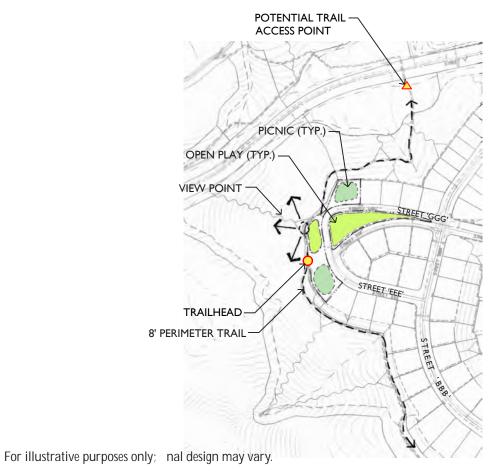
Typical Mini-Park Concept Plan (MP-20)
